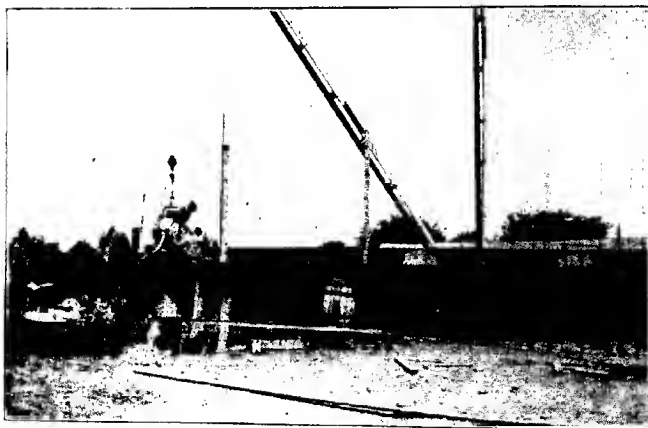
POURING CONCRETE INTO FORMS FOR THE FIRST SECTION OF A
